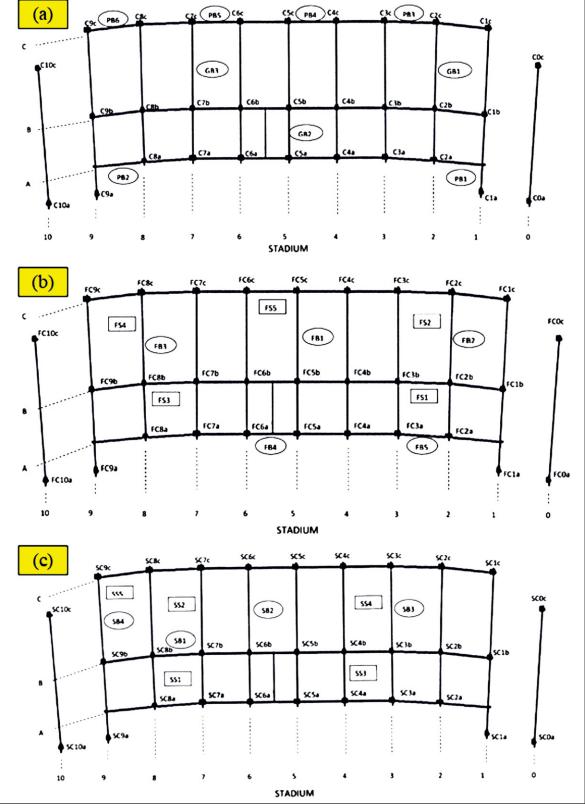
Plan of (a) Ground, (b) First and (c) second floor plan
